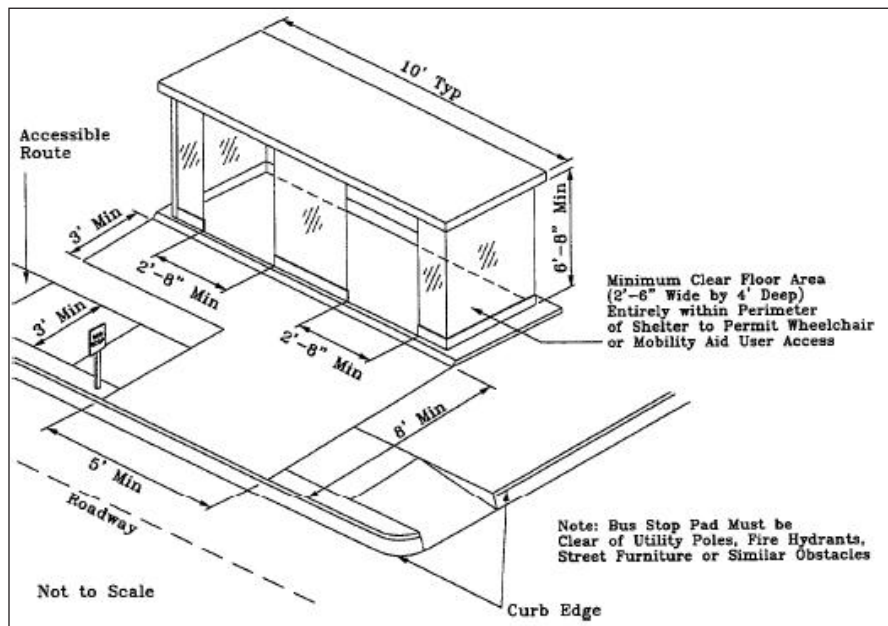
Minimum shelter and landing area dimensions to meet ADA requirements.
